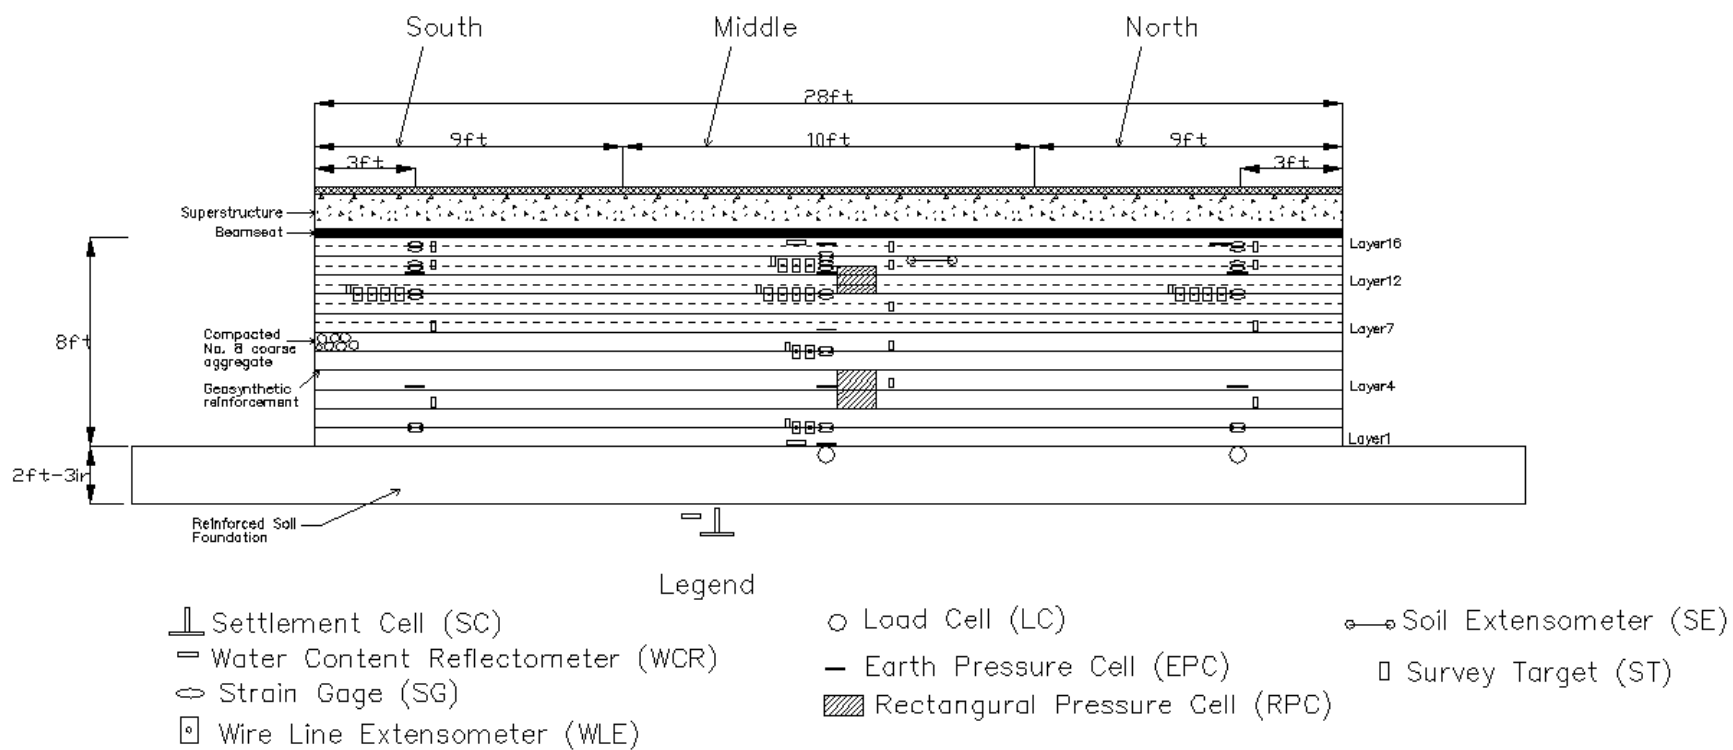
Layout of instrumentation in the transverse direction in abutment A
